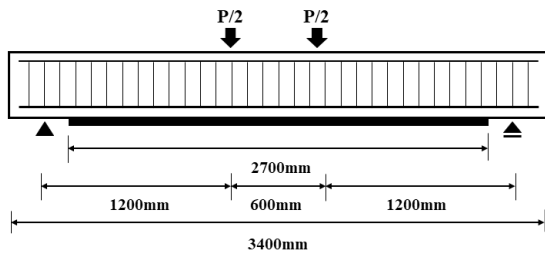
Specimen Specification Specimen Dimensions and Load Setup
